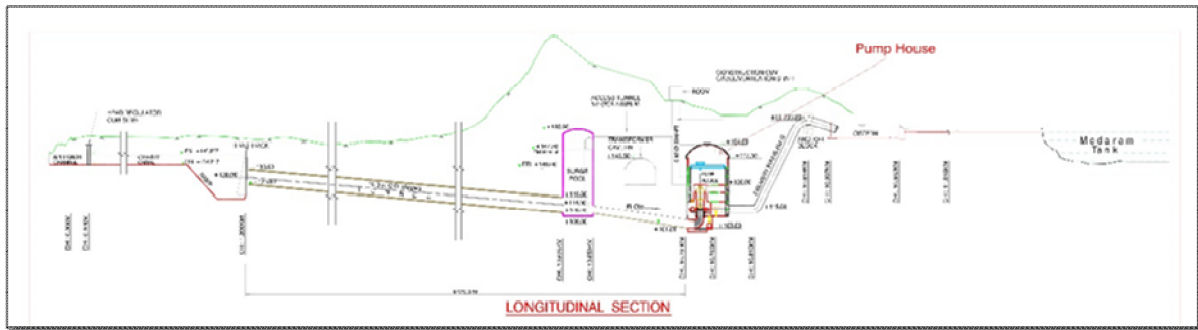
Longitudinal section of pump house and other components of package-6, of Kaleshwaram Lift Irrigation project
